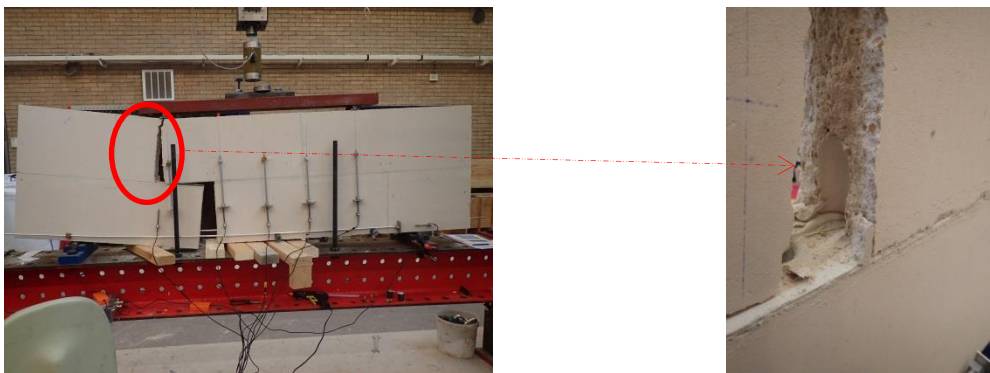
Crack pattern of specimen TUD_MAT-54d subjected to in-plane bending test.
